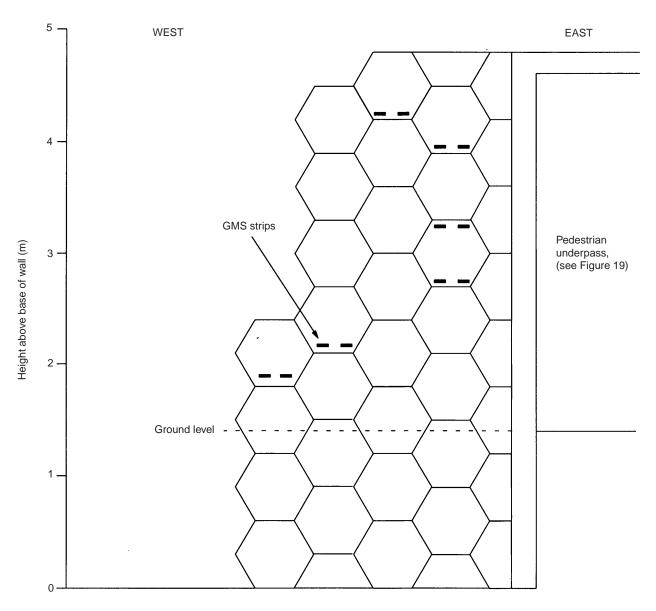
Location of strips used for electrochemical tests at the Whitley Bridge site
